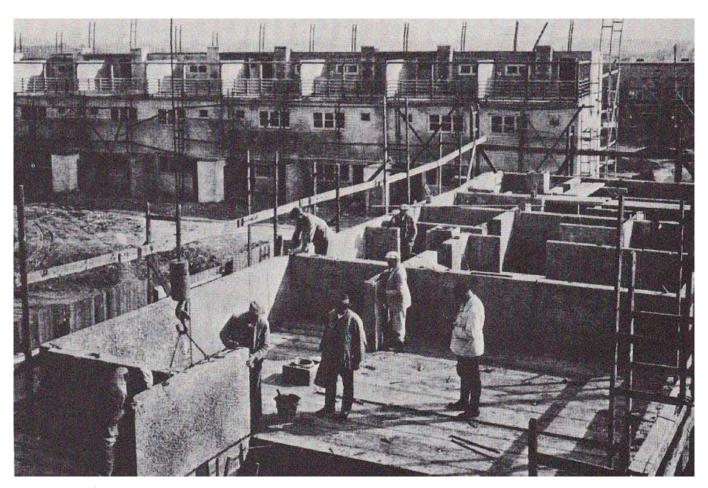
The Frankfurt precast concrete panel system by Ernst May.
